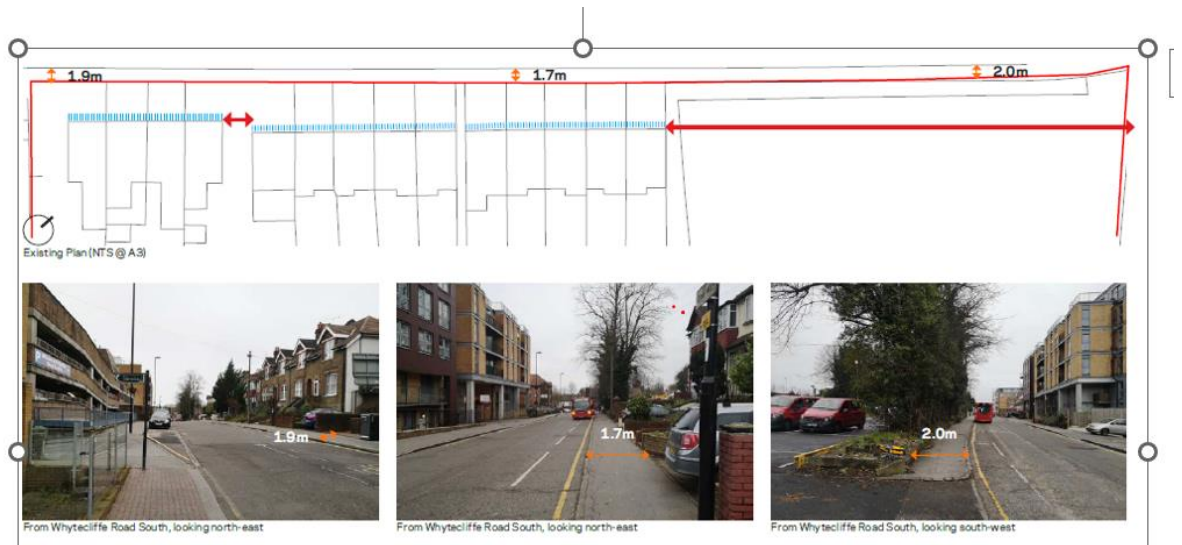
Plan of existing pavement widths and photos of relevant pavement section
